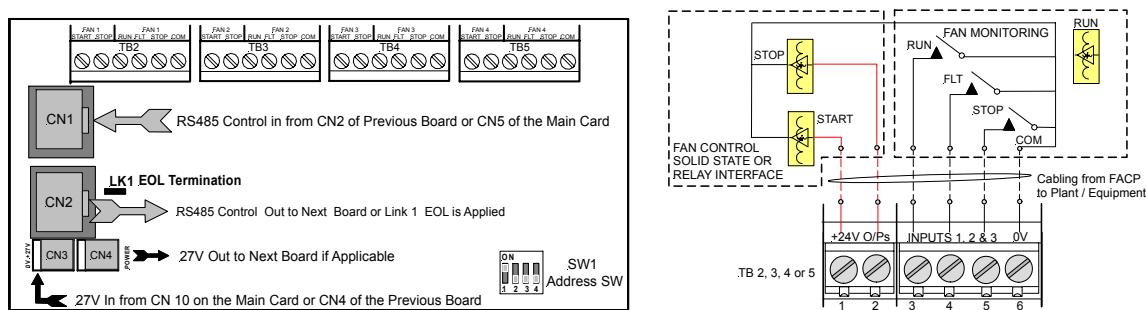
Fan Termination Board Layout and Typical I/O Wiring
